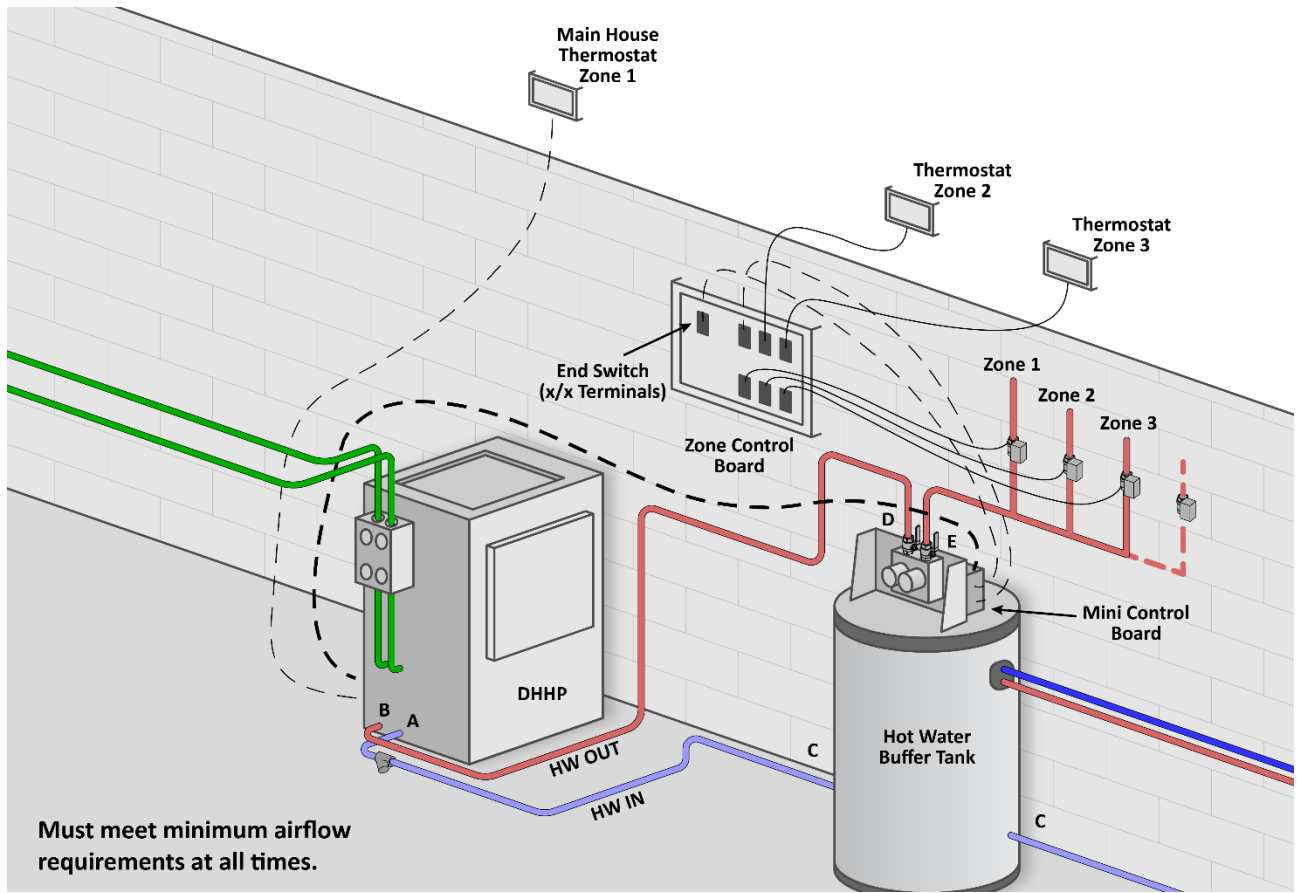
Multi-zone Hybrid configuration with zone valves. (Makeup Assembly not shown.)
